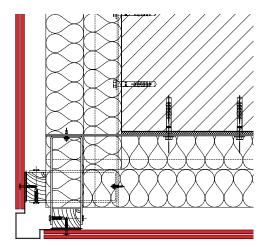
DETAILS OF CLAPBOARD FIXING WITH SCREWS
